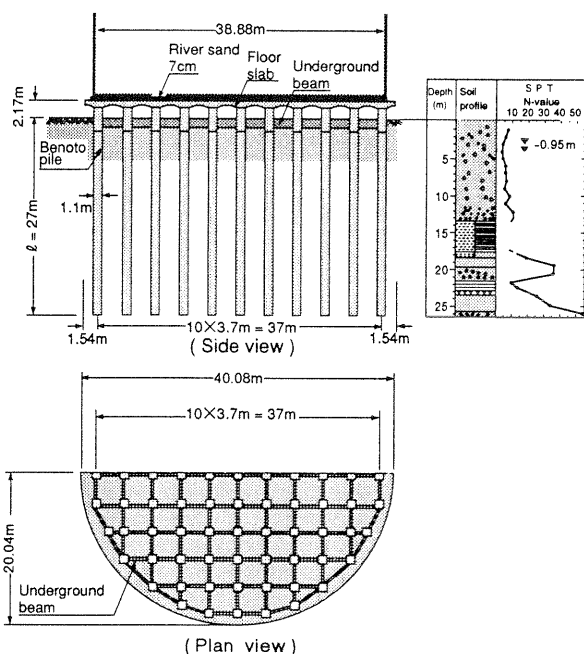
Side and plan views of the pile foundations of the cylindrical Tank 101
